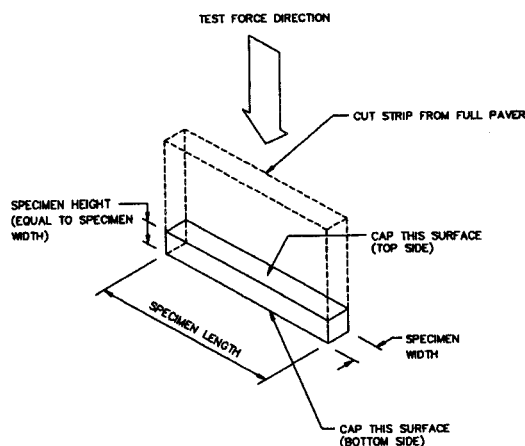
Compressive Strength Test Setup for Concrete Roof Pavers
